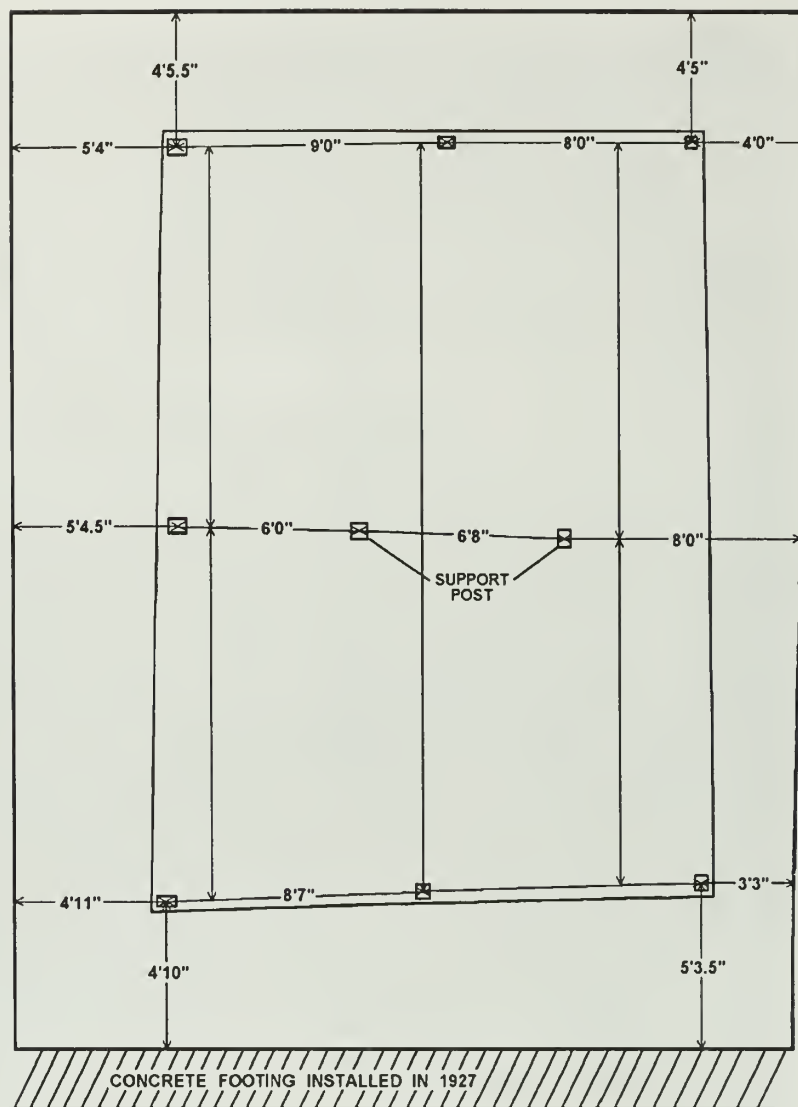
Plan view of Sutler's Store Basement No. 2, showing area covered by wooden floor (from Beaubien 1951a).
